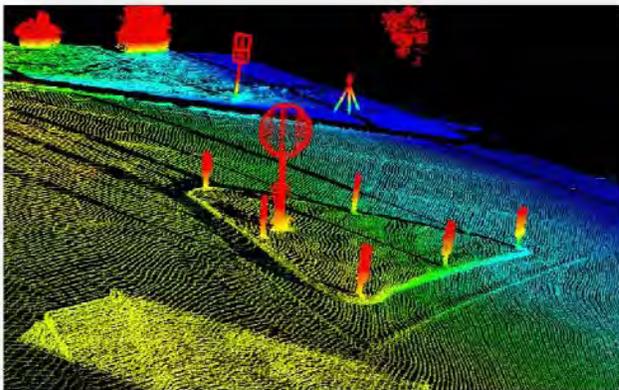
Static LiDAR Intersection Route A and Highway BB Colored by Elevation
